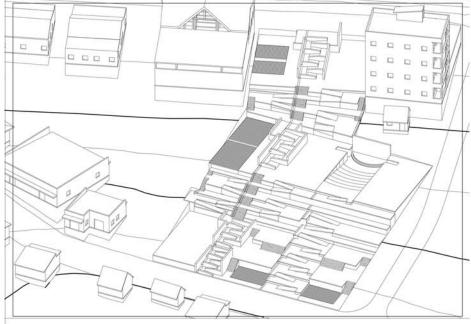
DESIGN DEVELOP-SITE PLAN MENT 100 - SITE PLAN University of Pretoria etd – Raveloarisan, R.S., (2003).
